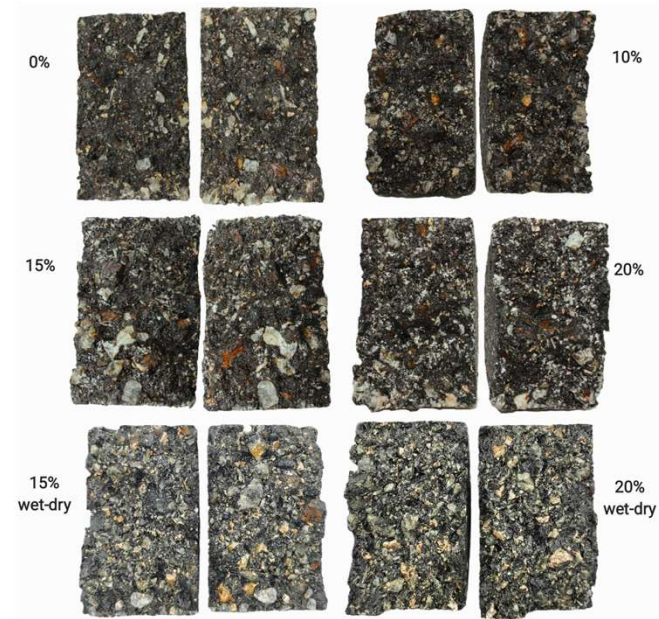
Photos of ITS fracture surfaces for salt conditioned feldspar samples
